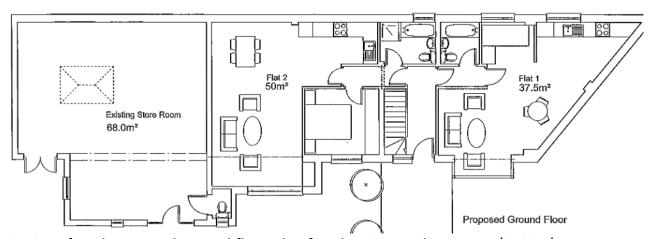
Refused proposed ground floor plan for planning application 15/01385/FUL.
